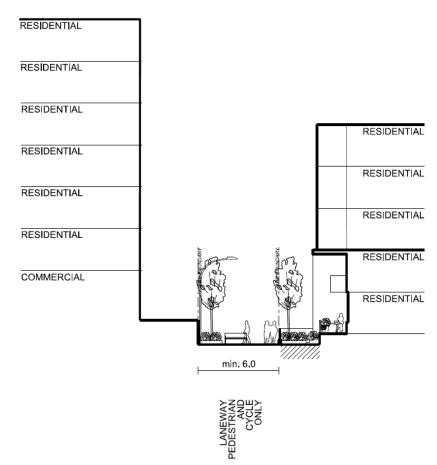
Section H – Laneway - Pedestrian and Cycle Only Typical Section – 6m
